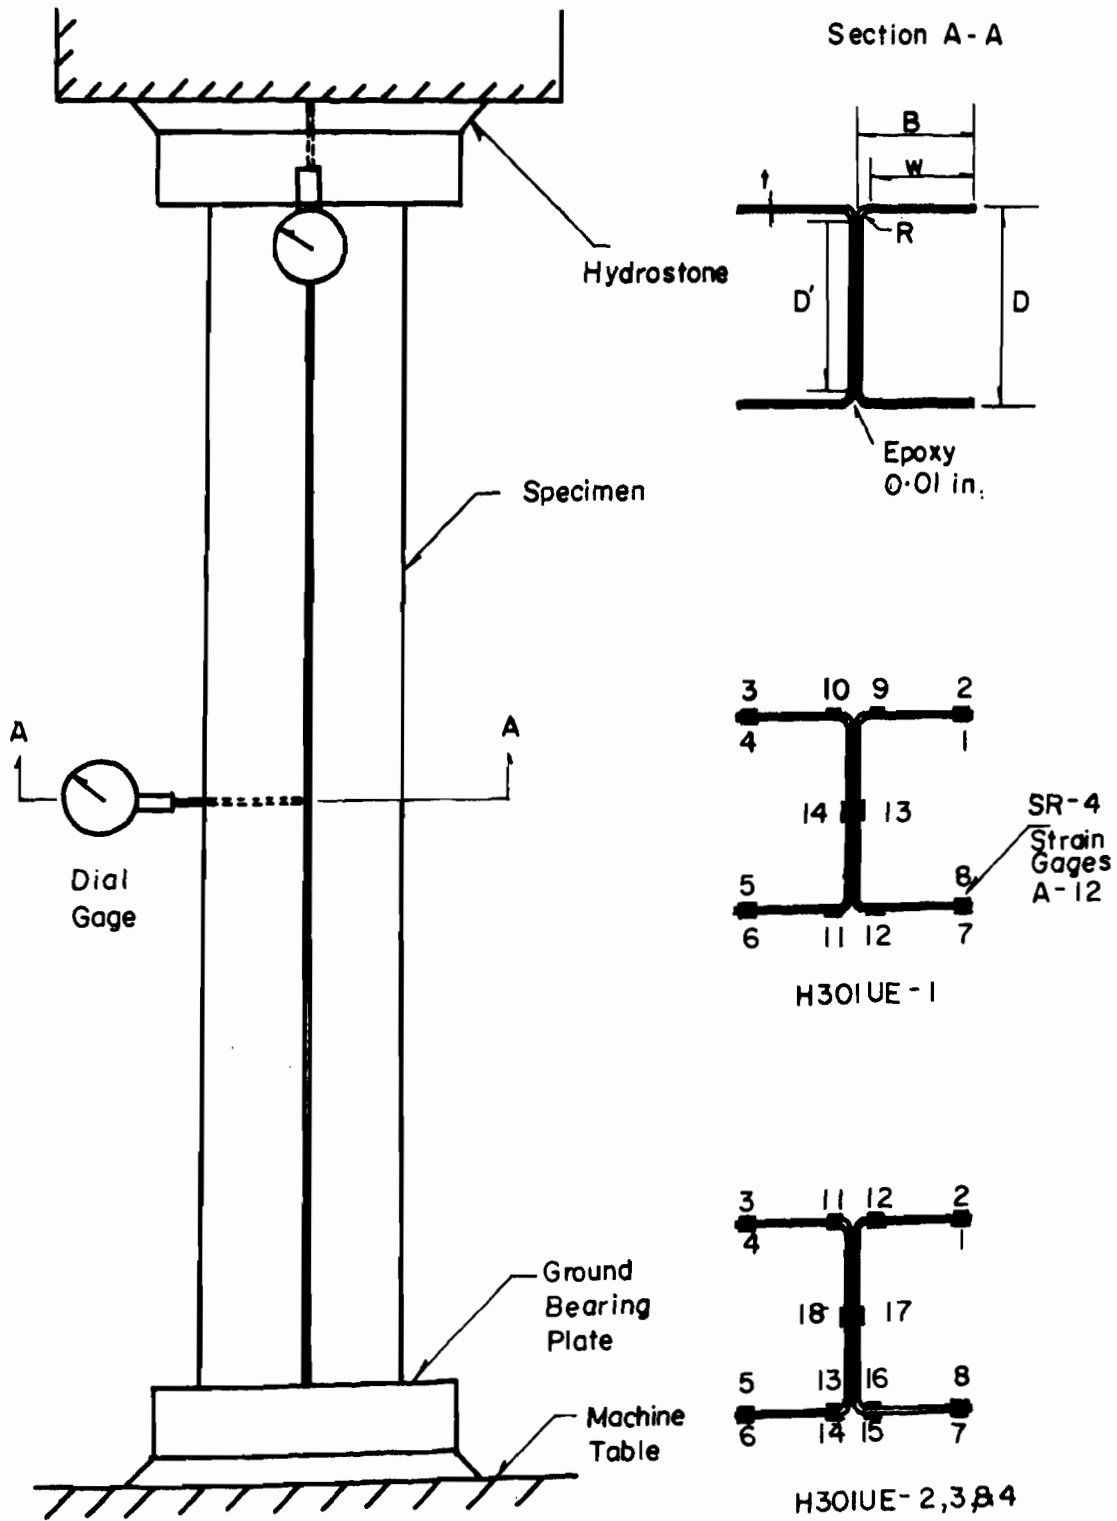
COMPRESSION SPECIMEN LOADING, CROSS SECTION, AND GAGING - UNSTIFFENED ELEMENTS, SERIES H301UE
